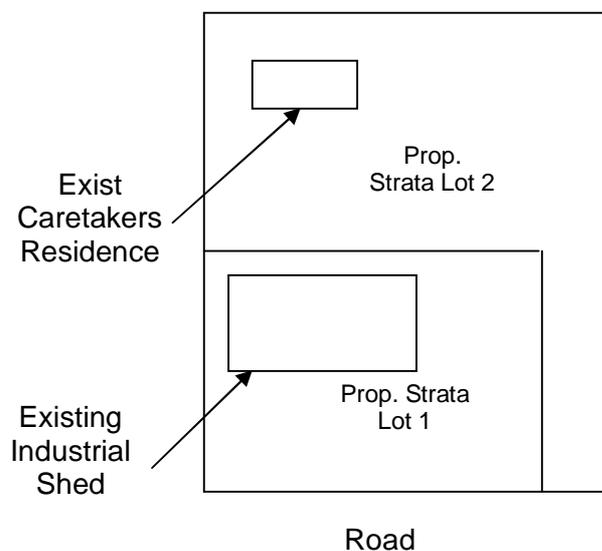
Proposed Survey Strata Subdivision – not supported
